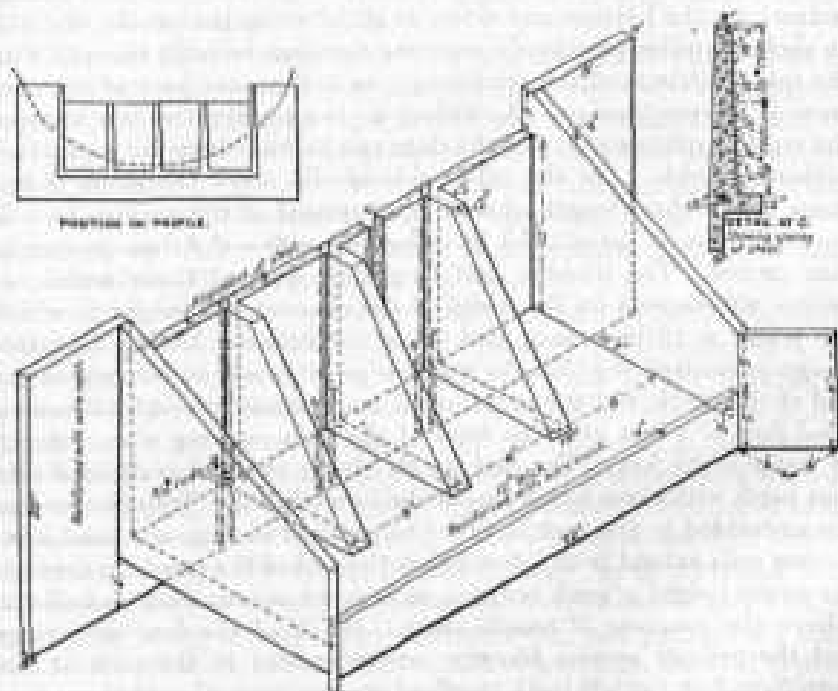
Outline of concrete dam for gravelly stream bed.
